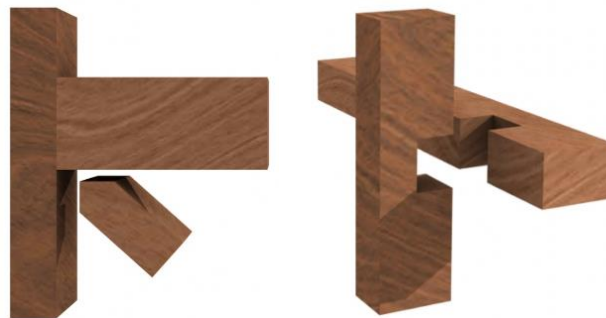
Carpentry joint connections: (a) Connection by contact. (b) Half-lap tee halving connection.
